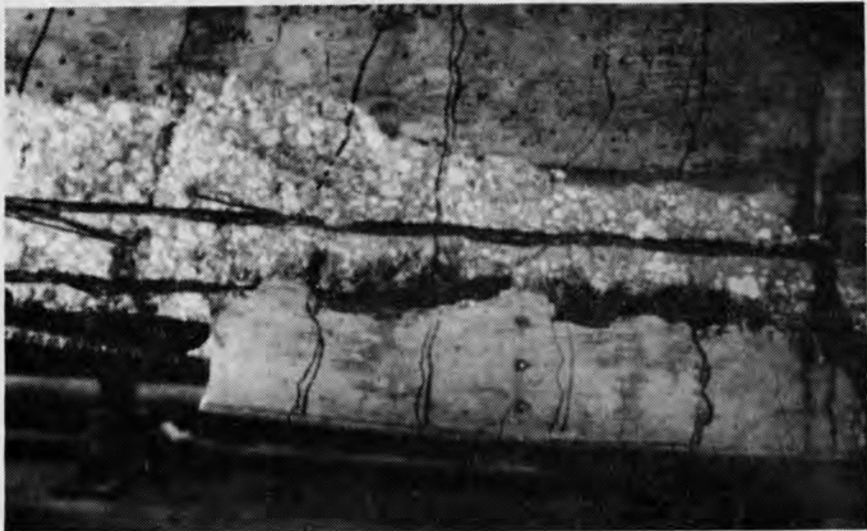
Buckling of reinforcing steel due to a lack of confinement
